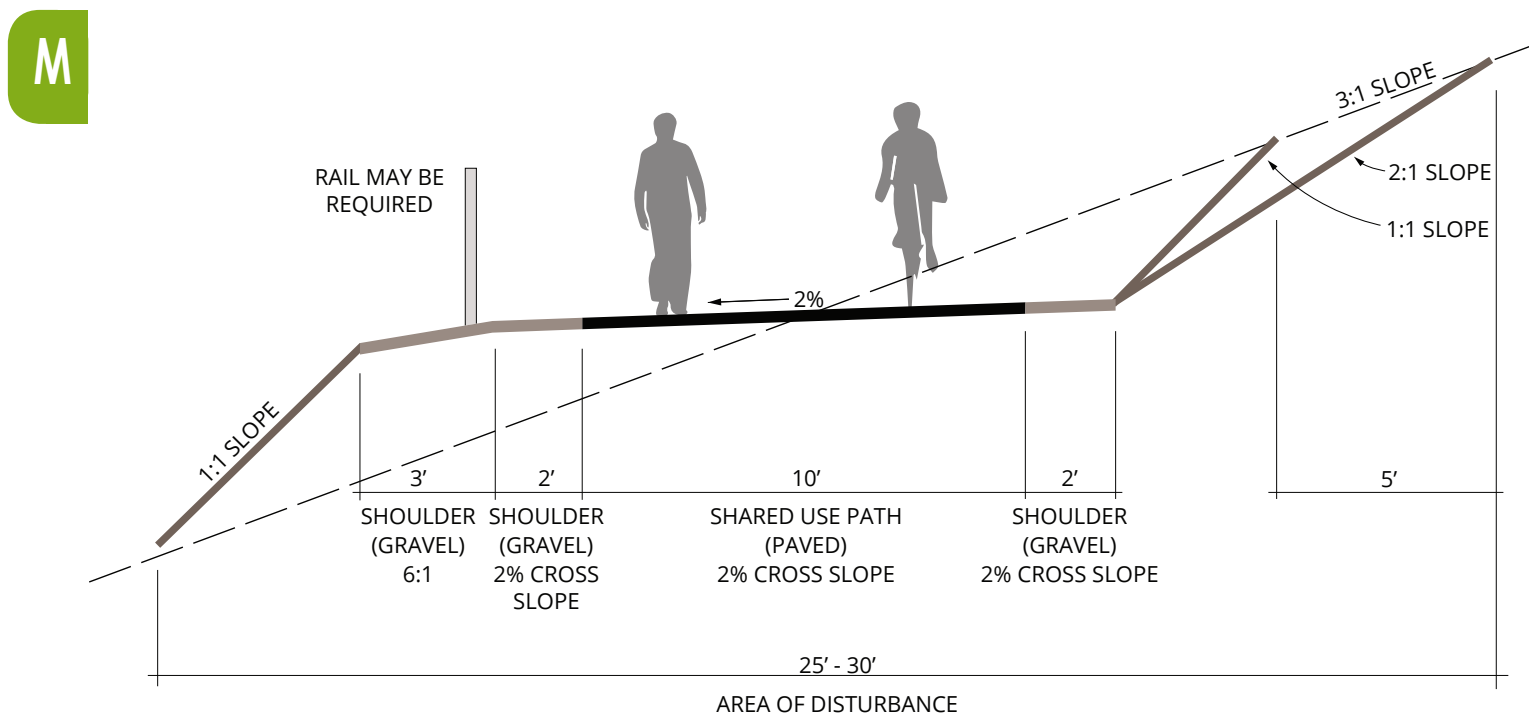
M: Trail Type E - Typical on 3:1 Cross-slope with No Walls
